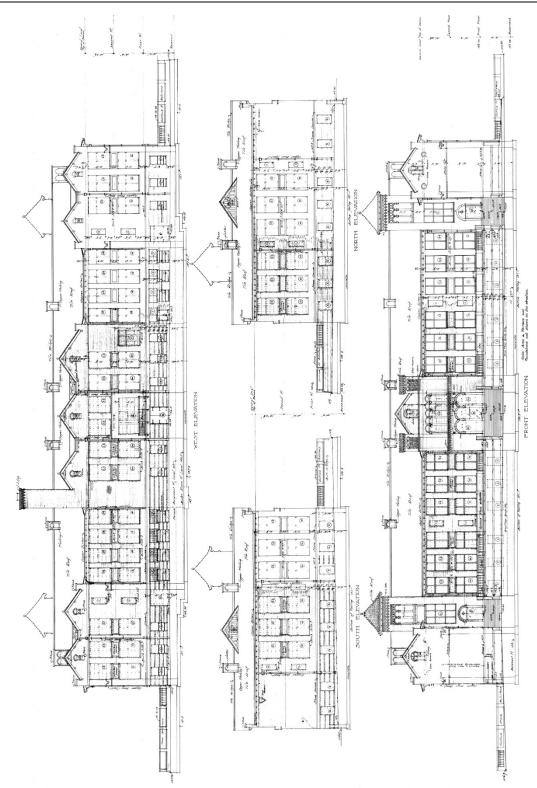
Original Fanning School Elevation Drawings (Courtesy of St. Louis Public Schools).
